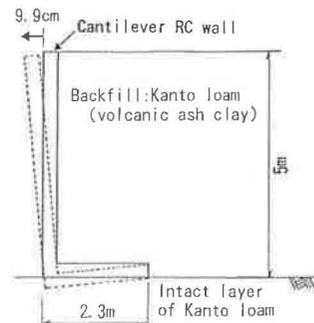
Experimental 5 m - high cantilever RC wall at Chiba Experimental Station, IIS, University of Tokyo
